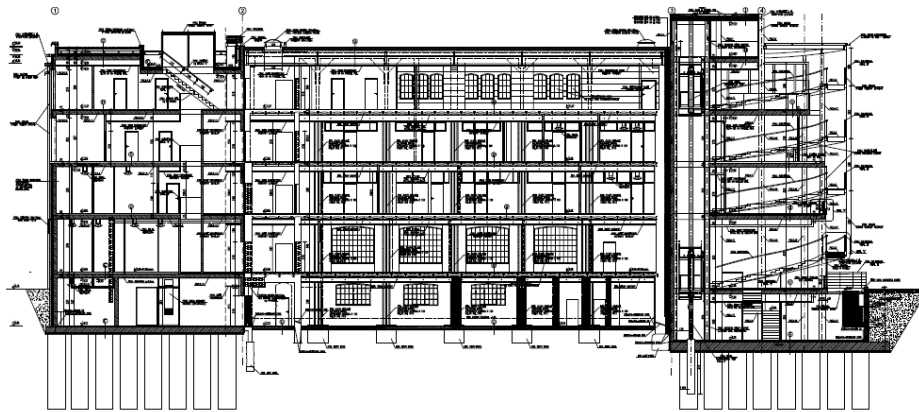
Distribution of jet grouting piles under part A and B (cross section)
